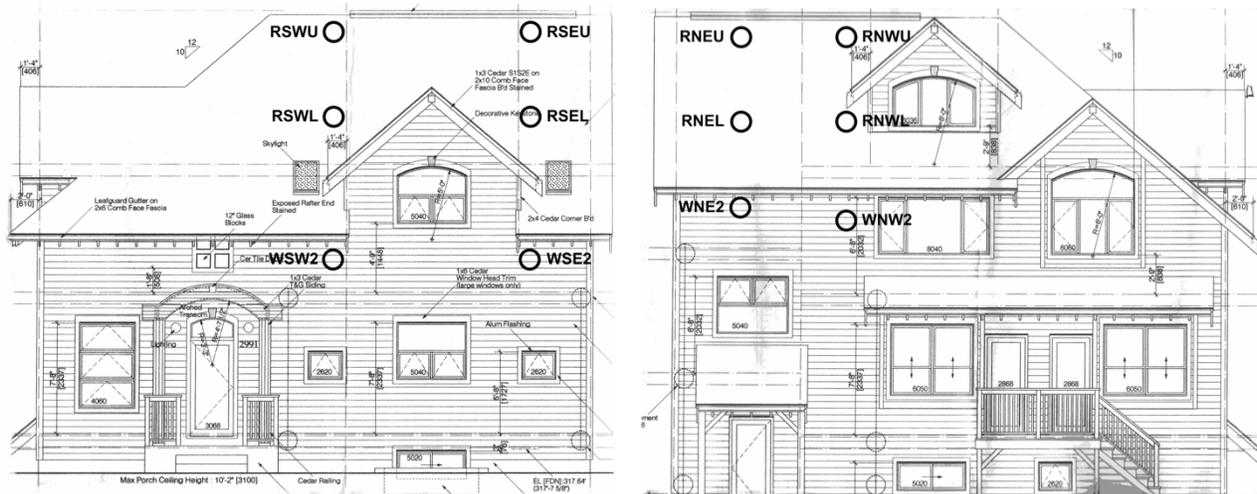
Monitoring Locations on the South-facing (left) and North-facing (right) Roof Slopes
